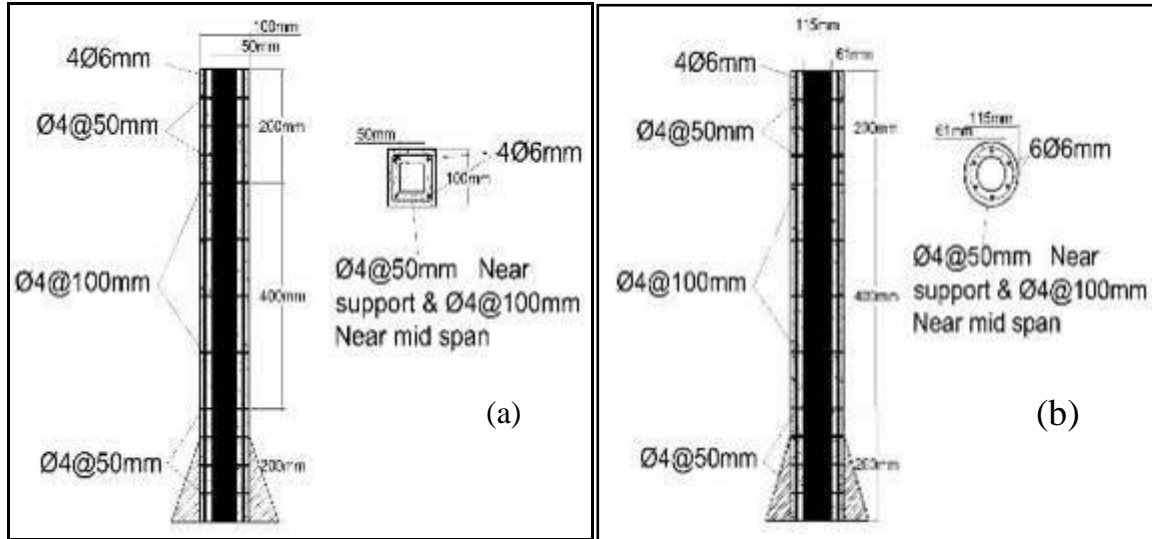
Reinforcement Details for Specimens (a) Square Section Specimens (b) Circular Section Specimens
